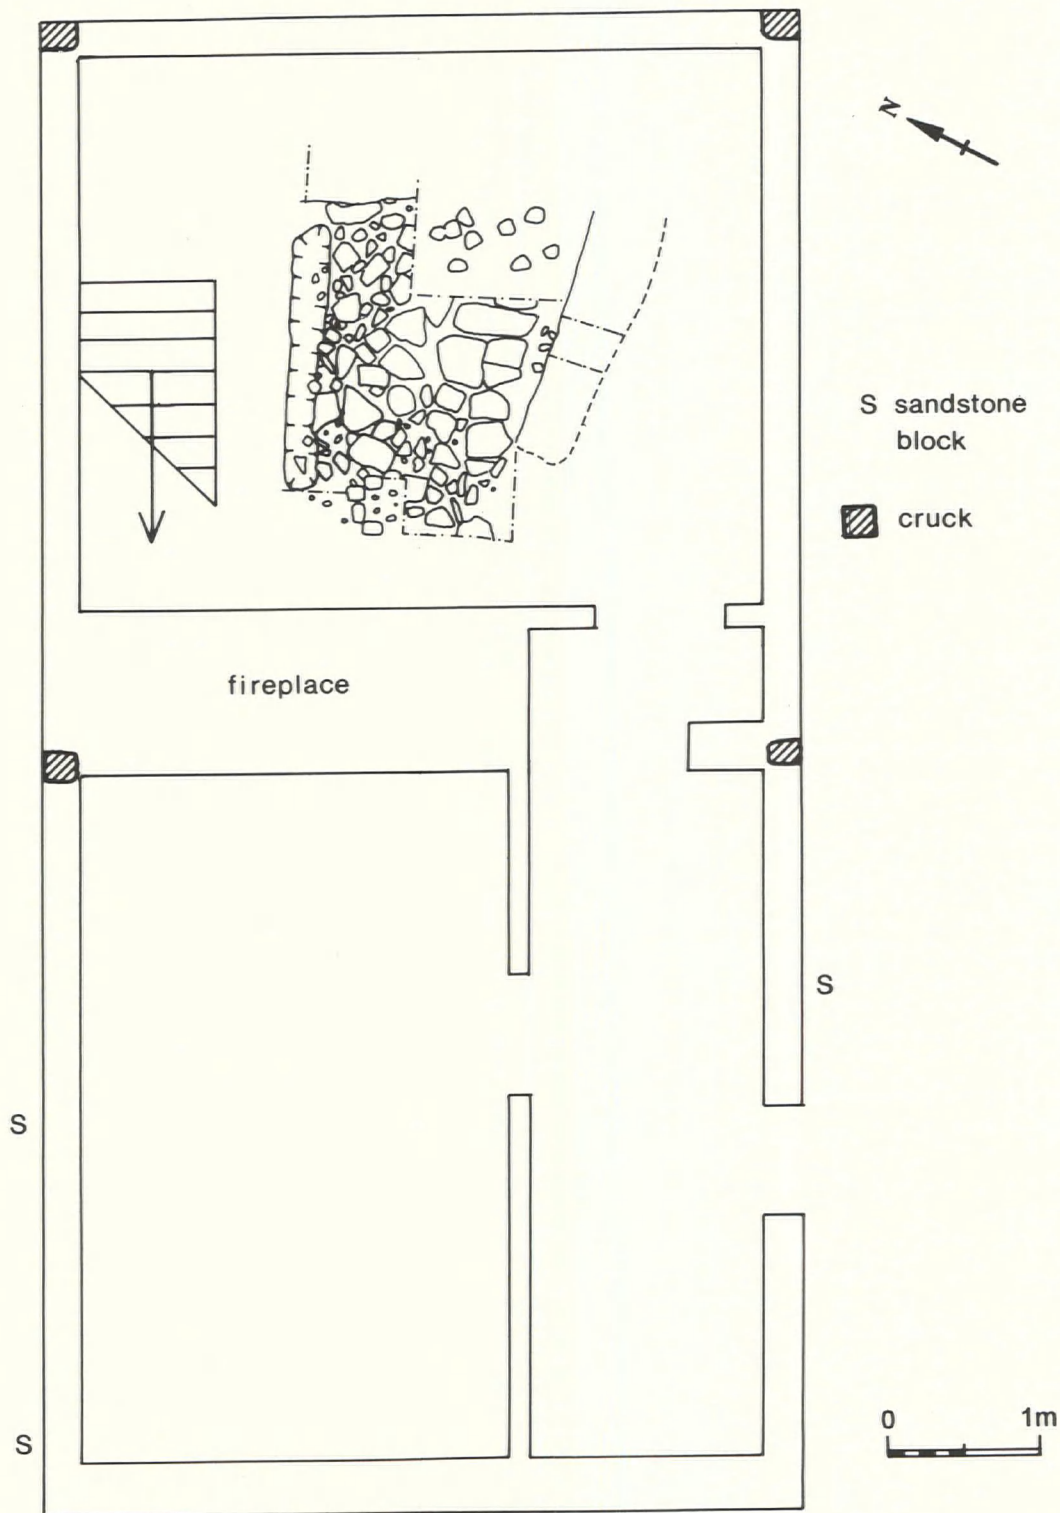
Ground plan (after Alcock and Woodward (1976)) showing surviving archaeological deposits in E bay
